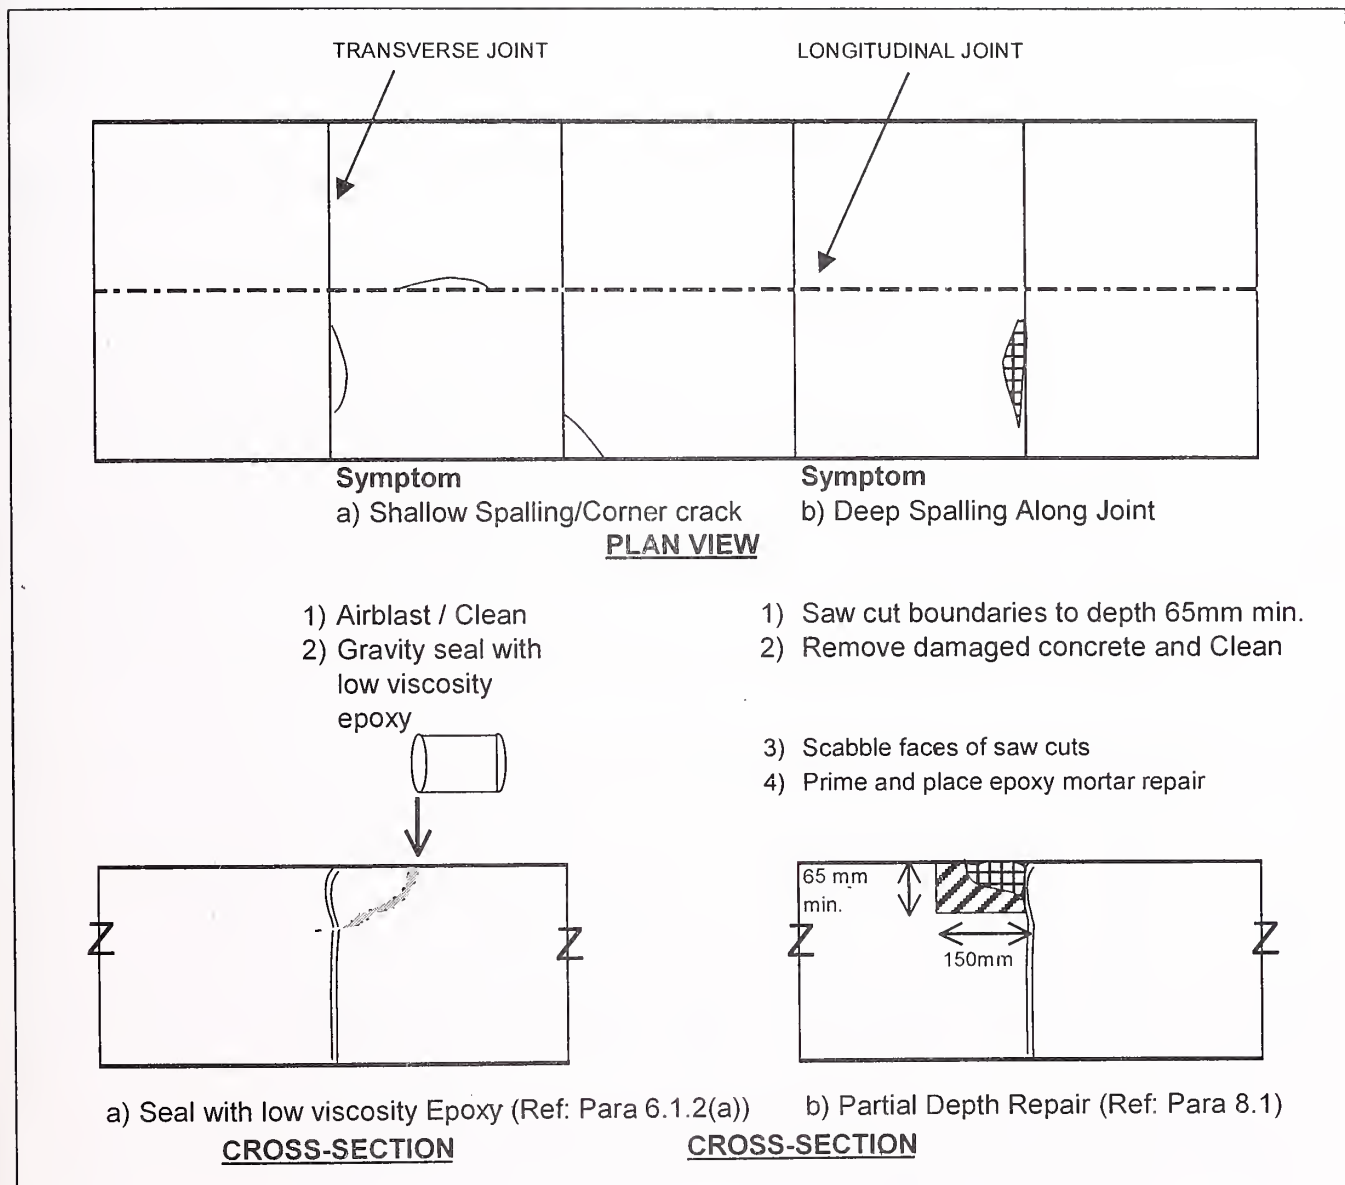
Repair of Shallow Cracking and Spalling Near the Joints
